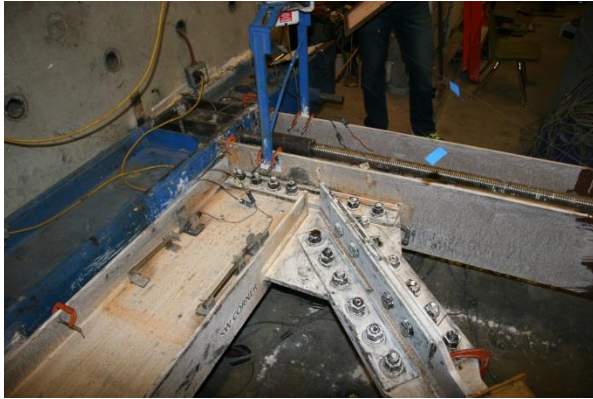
Specimen NCBF2-R1 Connection Detail
